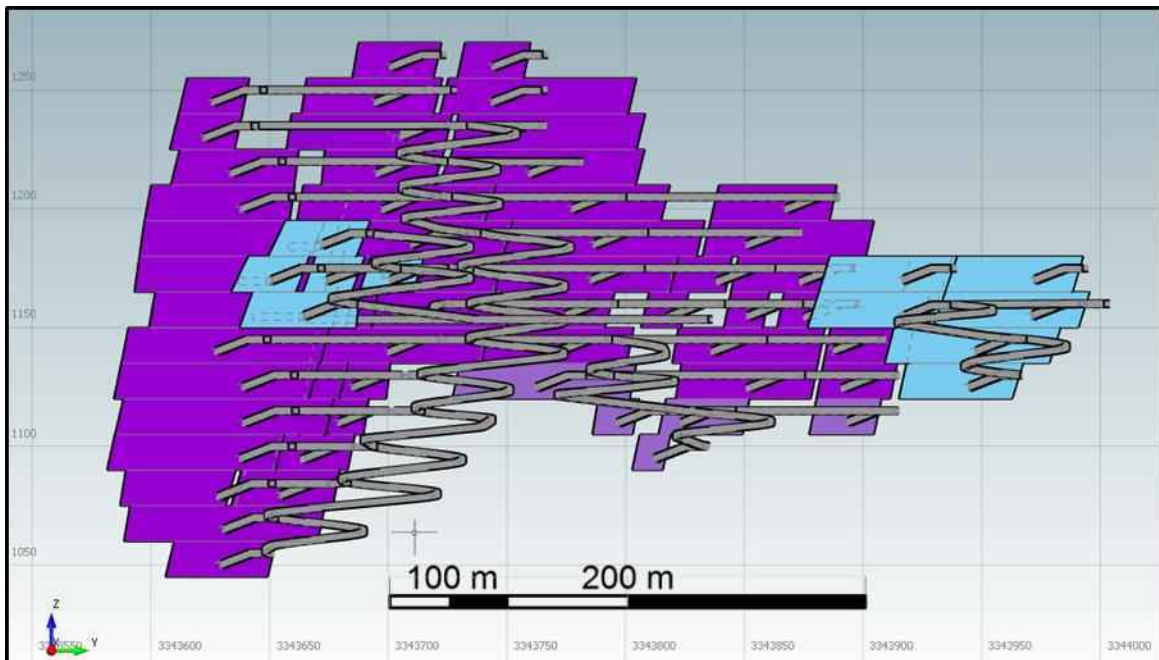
Babicanora Central Development – Long Section View (Looking North)
